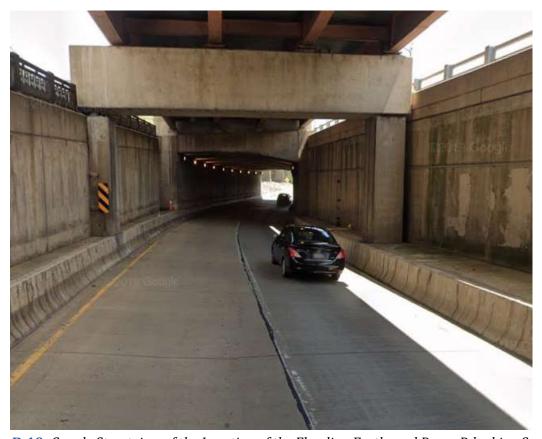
Google Streetview of the Location of the Flooding Eastbound Ramp D looking Southeast
